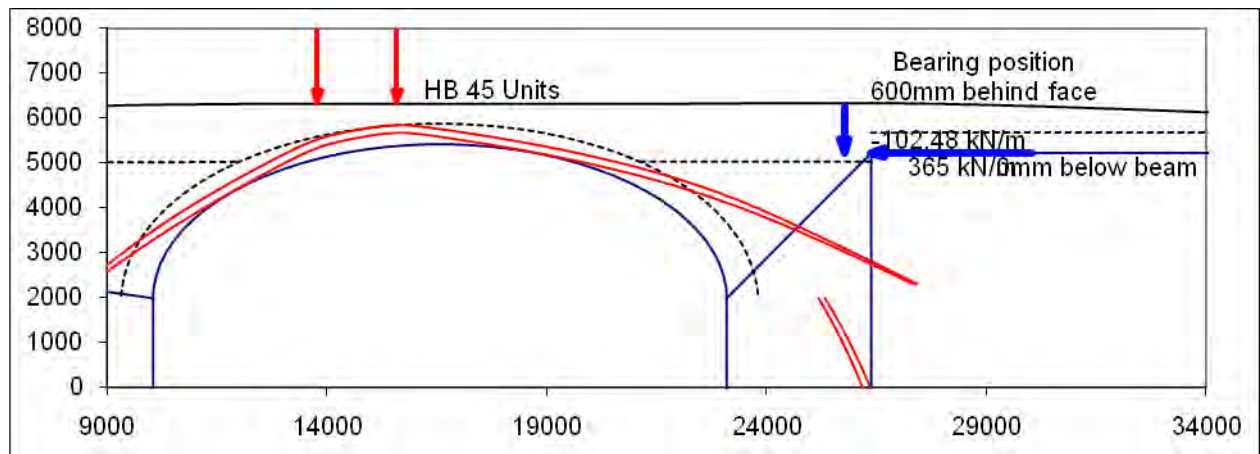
Thrust layout in a bridge with a beam span, plotted in Excel
